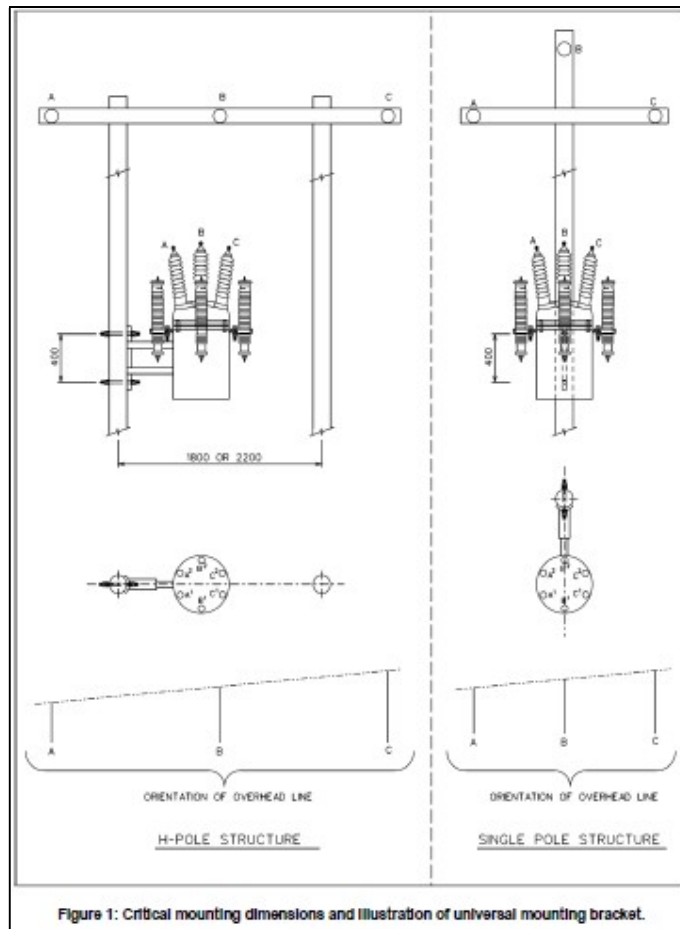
Critical mounting dimensions and illustration of universal mounting bracket.
